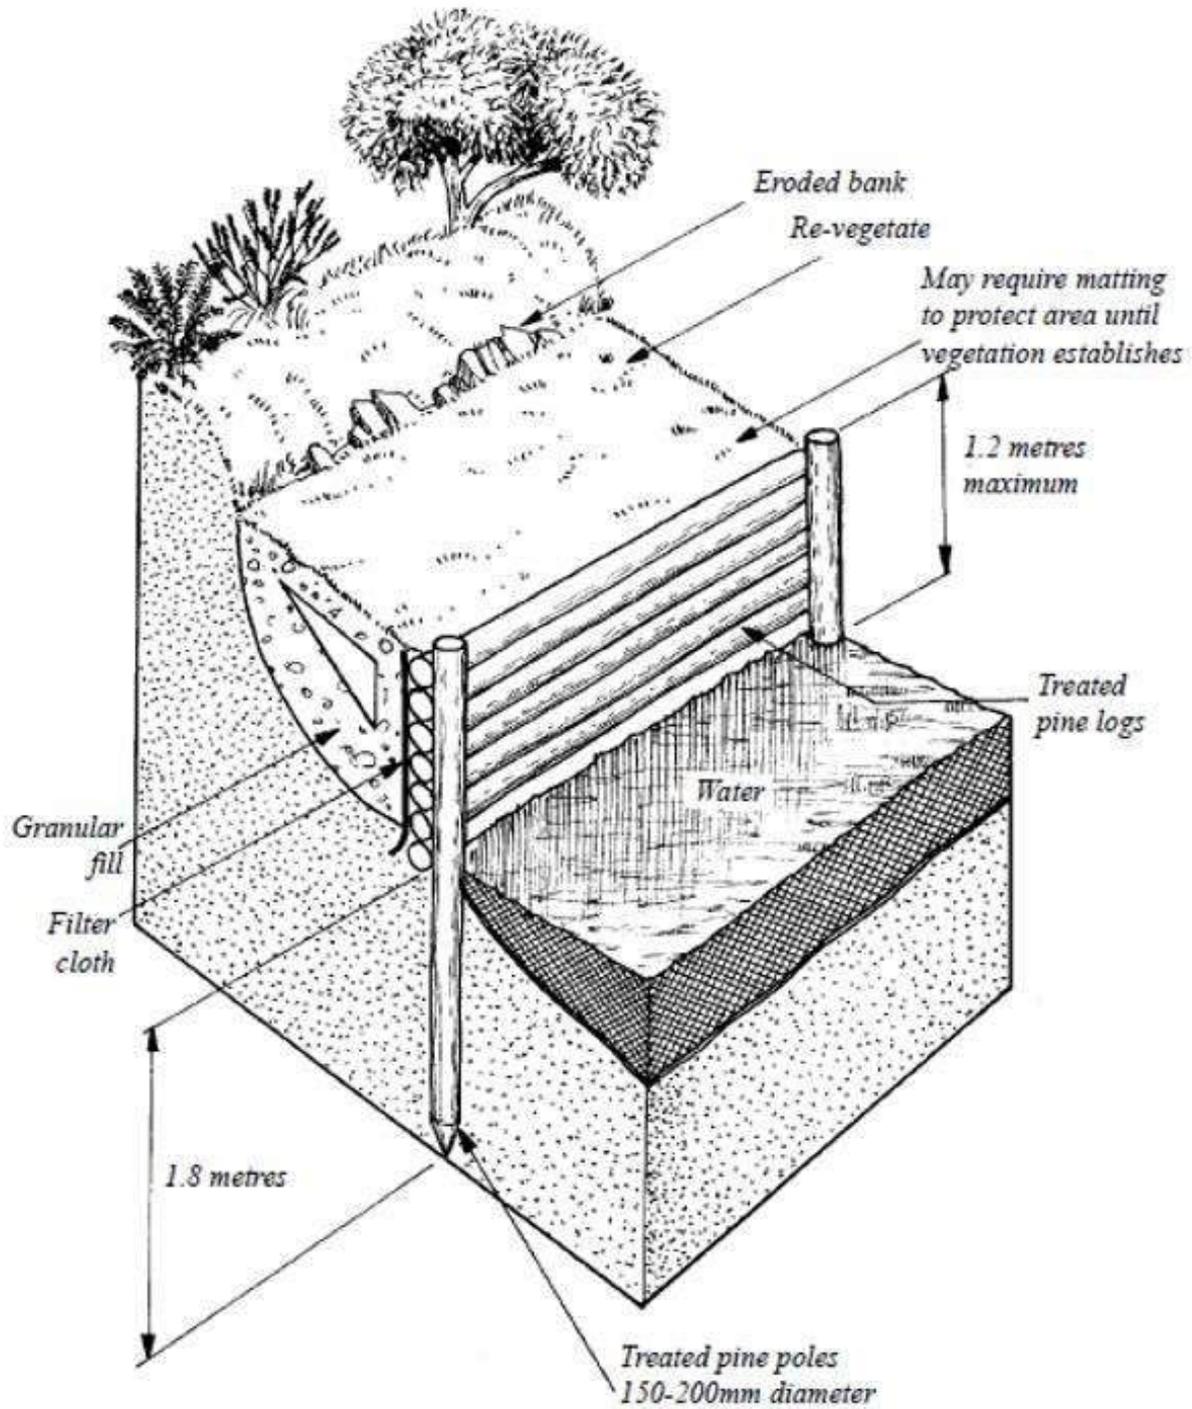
Piled log wall (Water and Rivers Commission, 2000)
